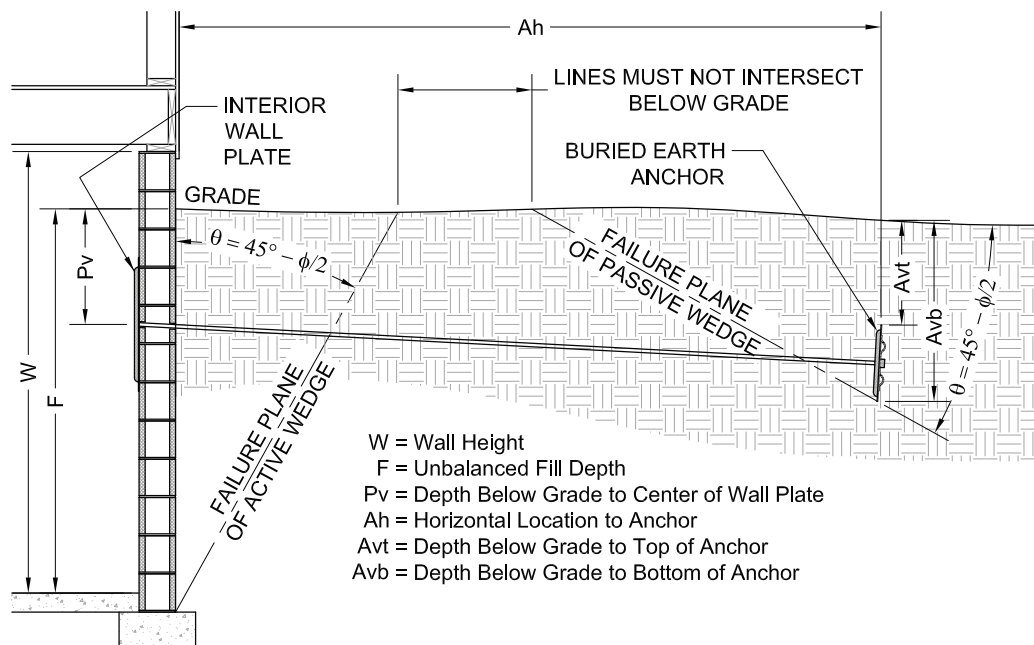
General arrangement of GeoLock® Wall Anchor System
